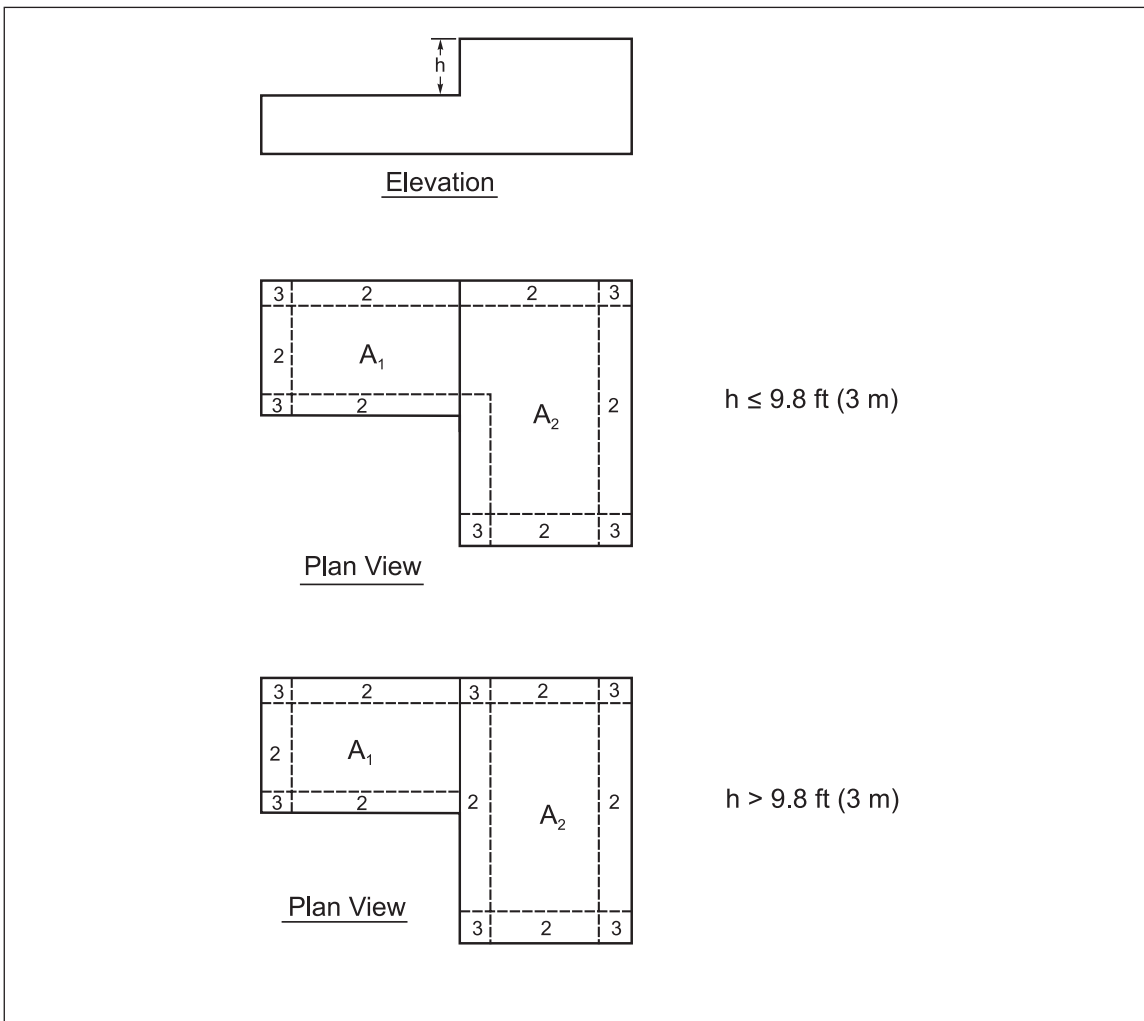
Roof zone designations for a roof with a height differential
